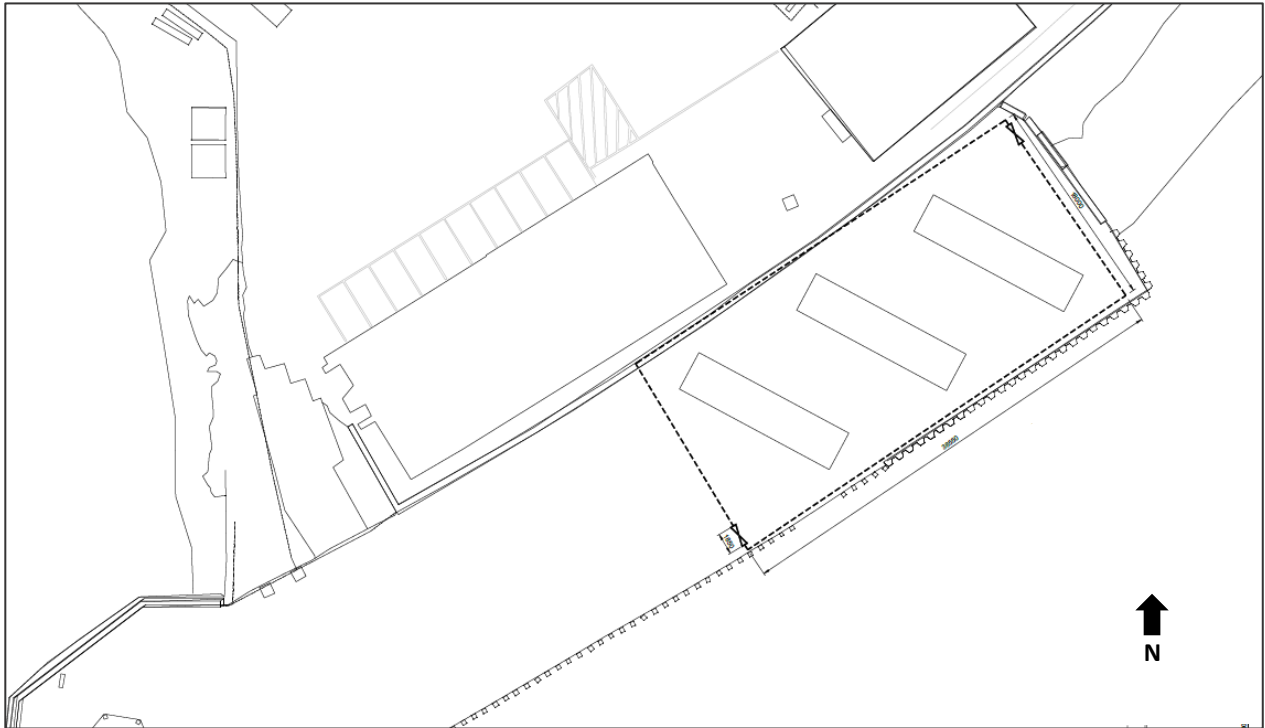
Indicative site layout at the Proposed location of Wall Structures on North Pier
